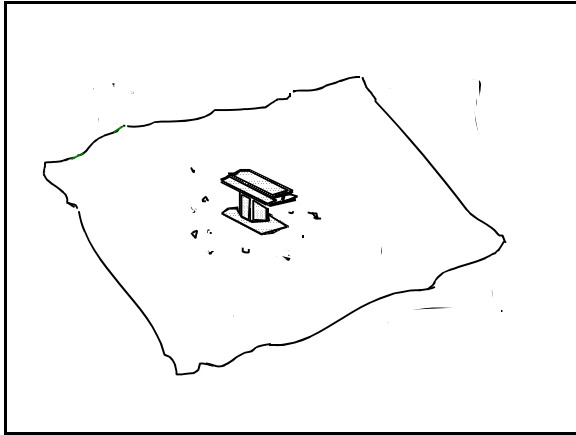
Ground Cover with ground sheet used under working area to collect debris.
